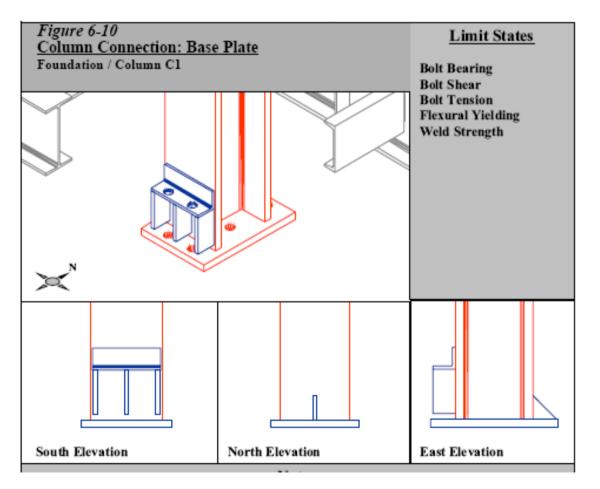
Column Connection: Base Plate Foundation / Column C1
